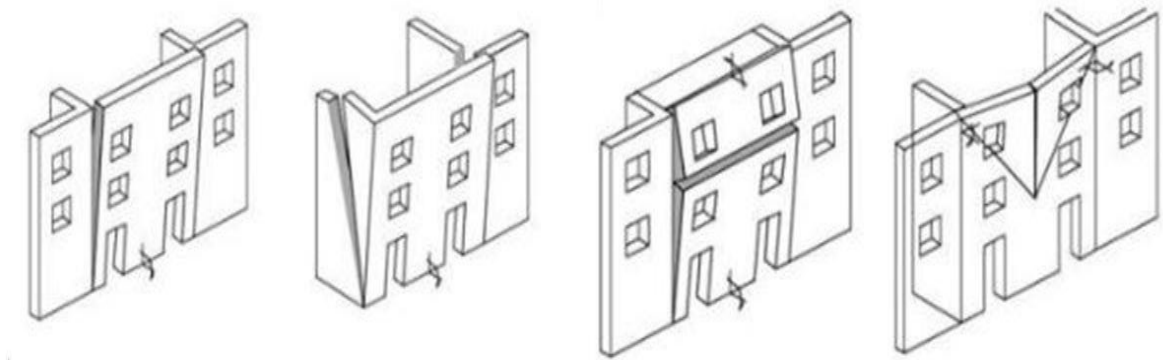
Out of plane failure of masonry [Salat Z., 2015]
